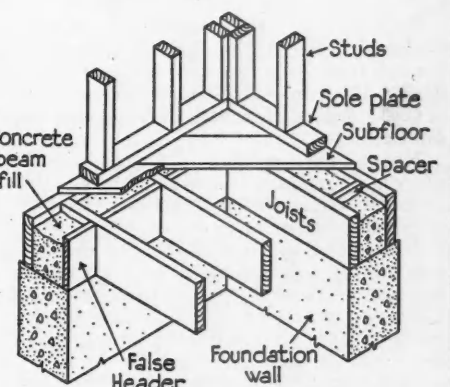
BOX SILL ASSEMBLY WITHOUT SILL PLATE
